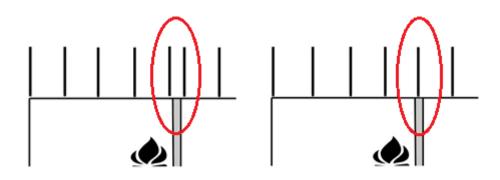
Simplified section of a proper truss arrangement to the left and a poor arrangement to the right (Järphag 2011).
